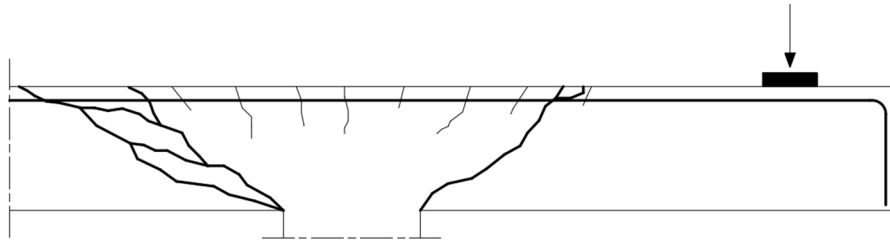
Crack pattern in a section of a slab with punching shear failure.
